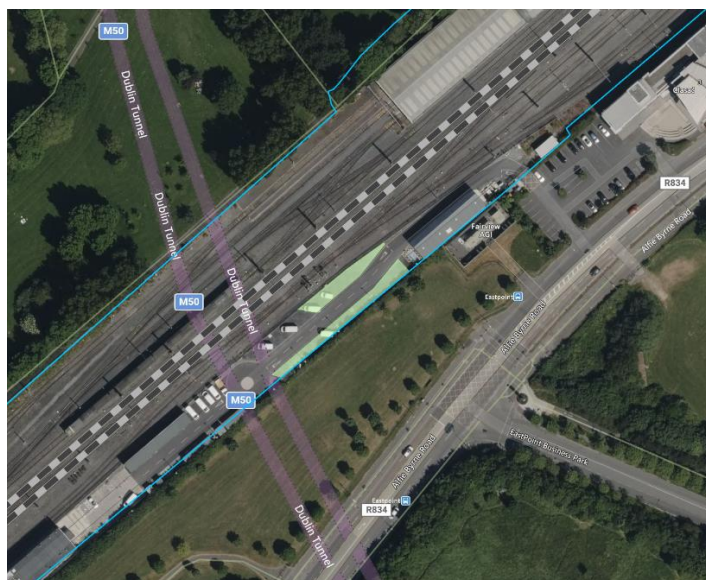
Excerpt from Railway Order Application Work Plan 01
